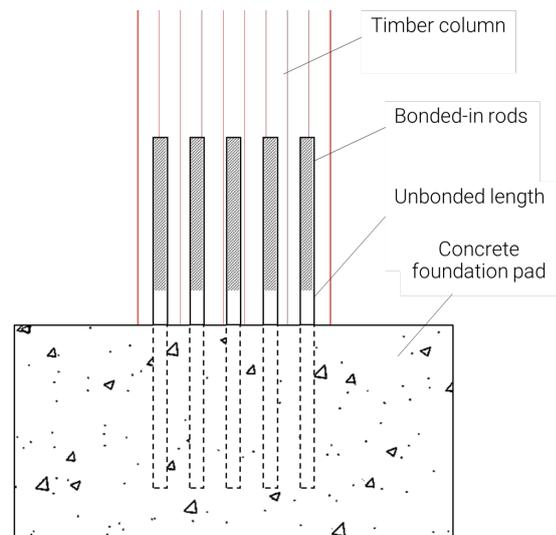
Detailing of the semi-rigid column base connection in timber baseline designs
